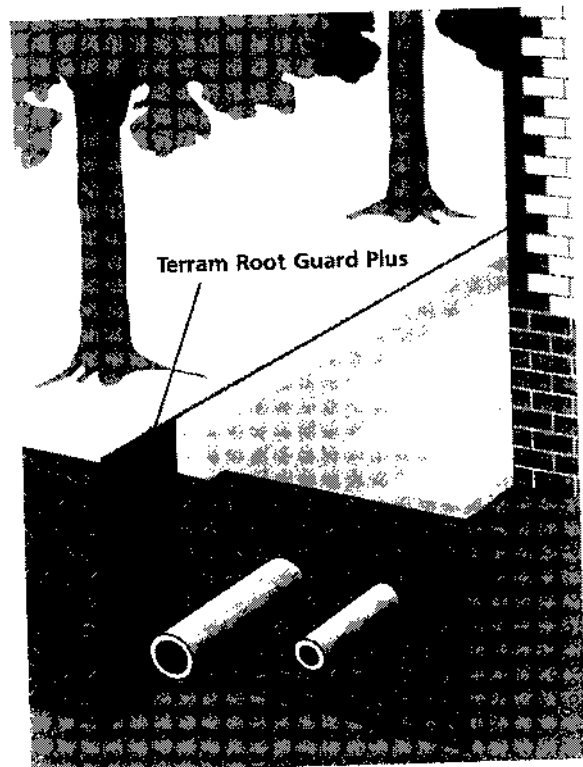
Terram Root Guard Plus installed as a vertical barrier can protect pavements, underground services, walls and foundations.
